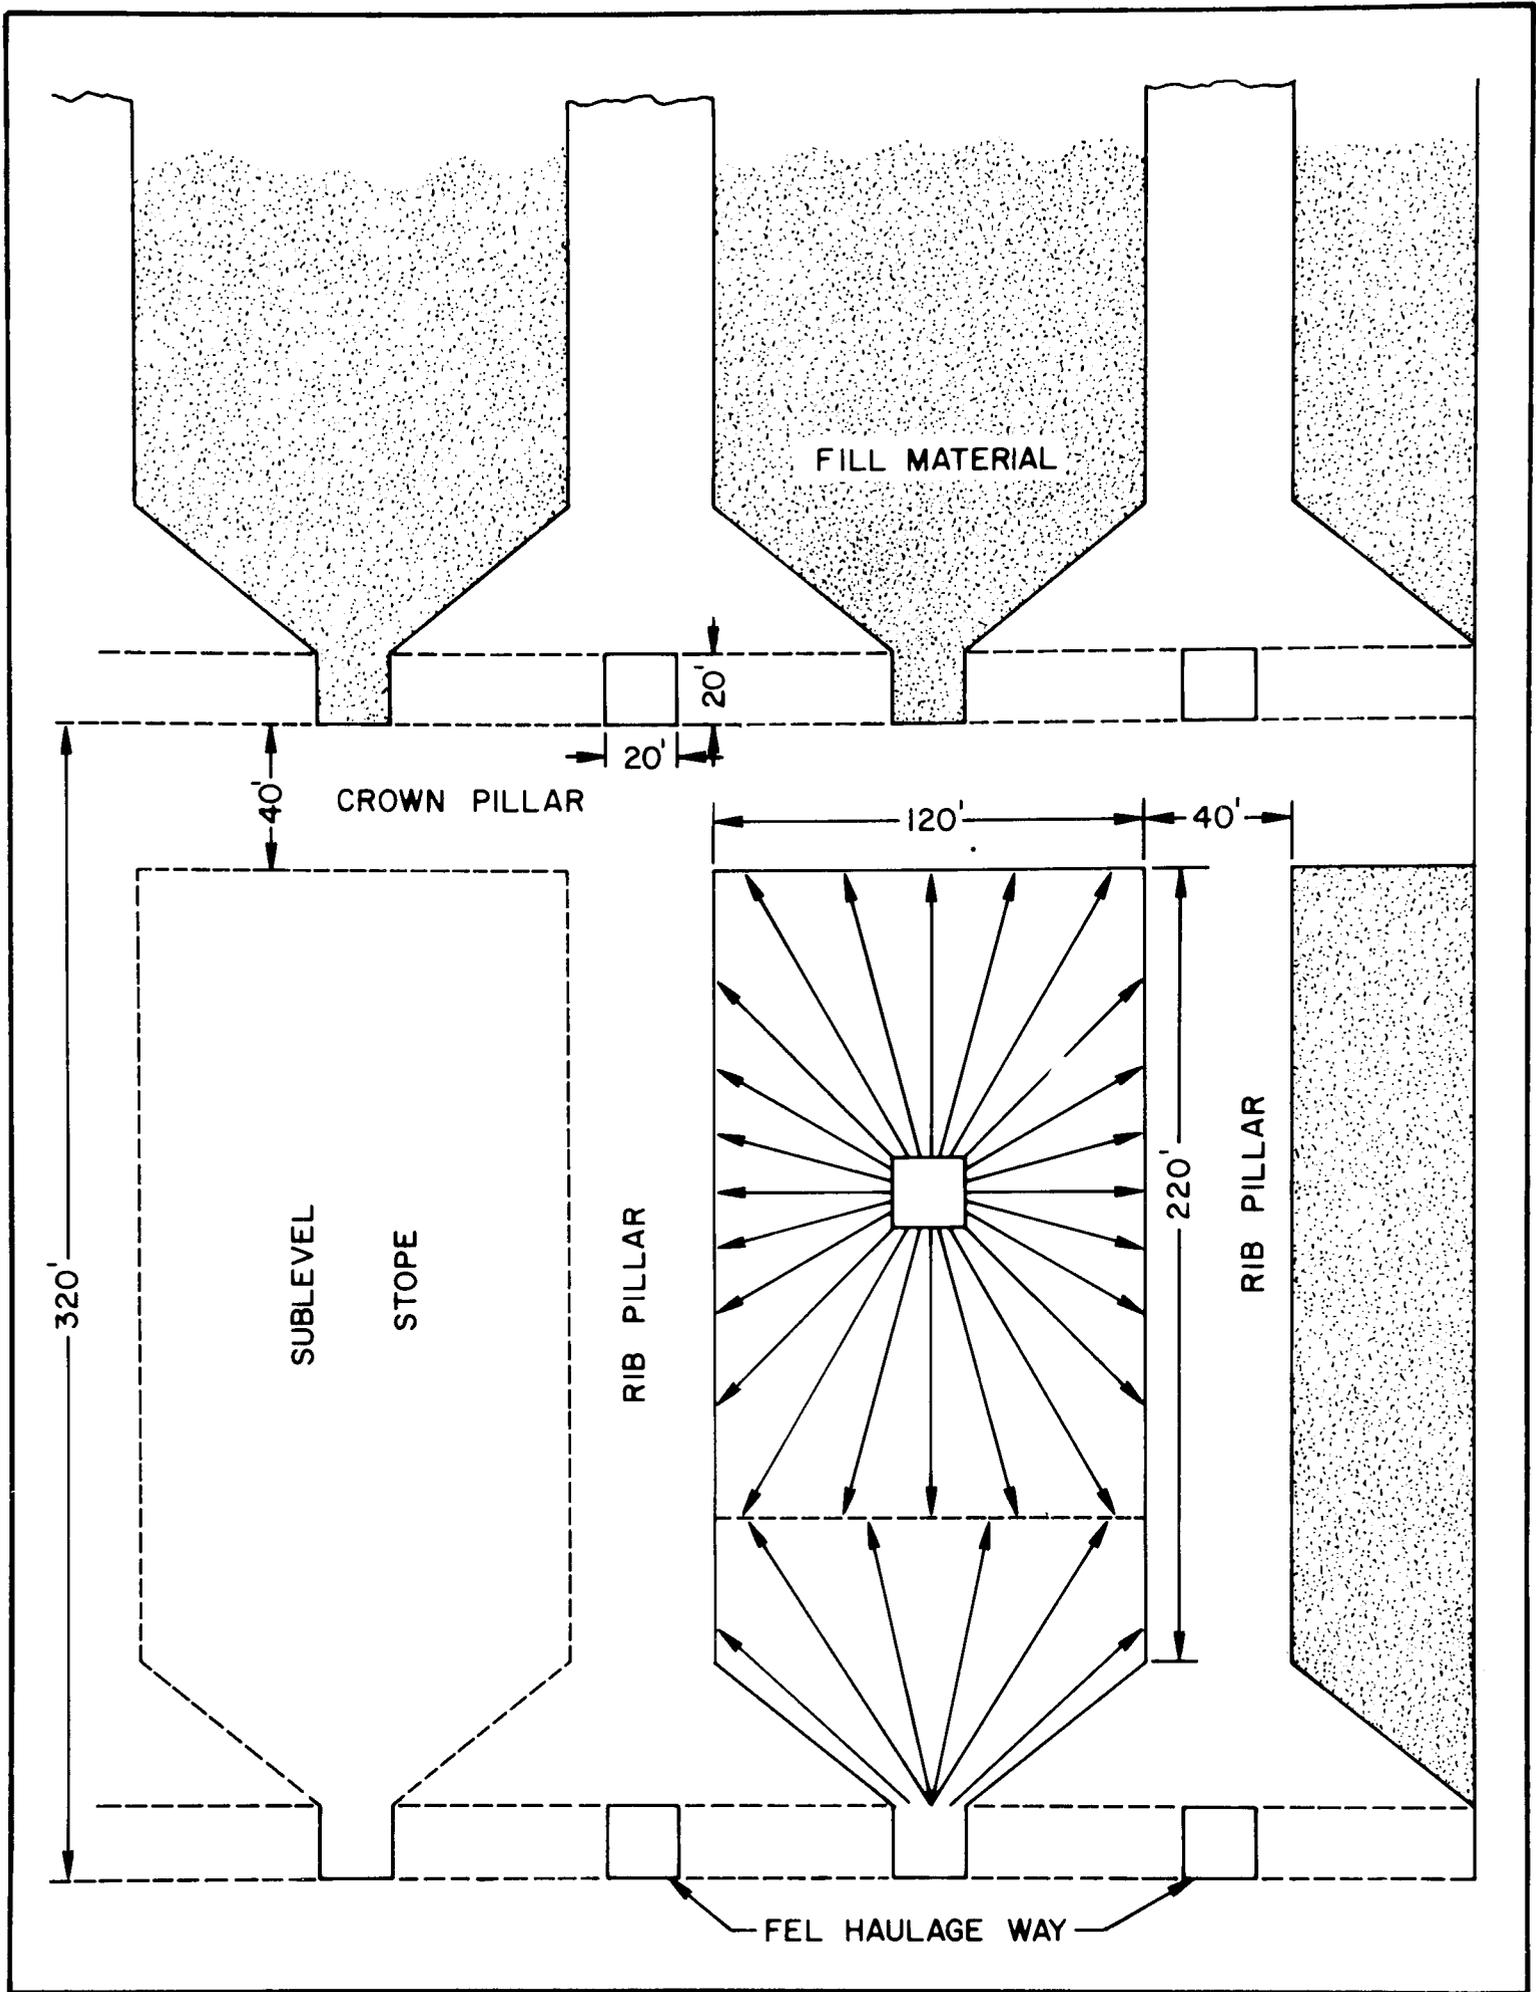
Vertical Section Through A-A', Sublevel Stoping with Spent Shale Backfill
